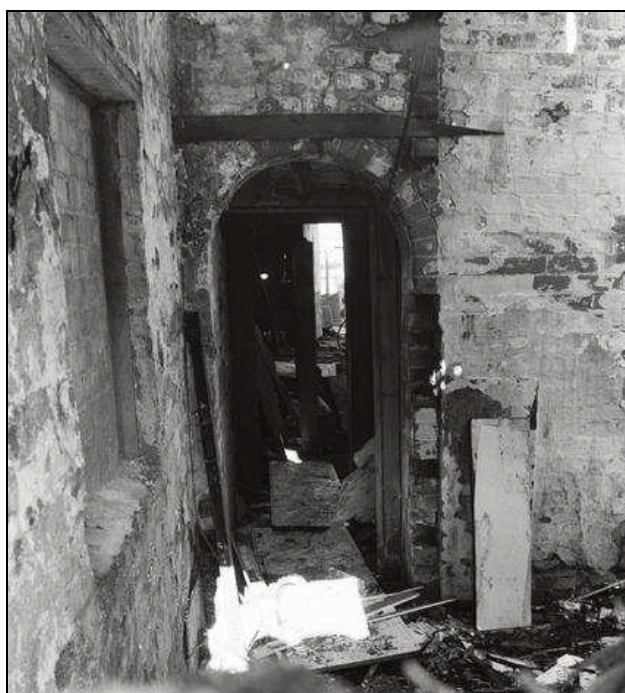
Semi-circular headed doorway accessing rope alley, internal north elevation, western shed, Building C
